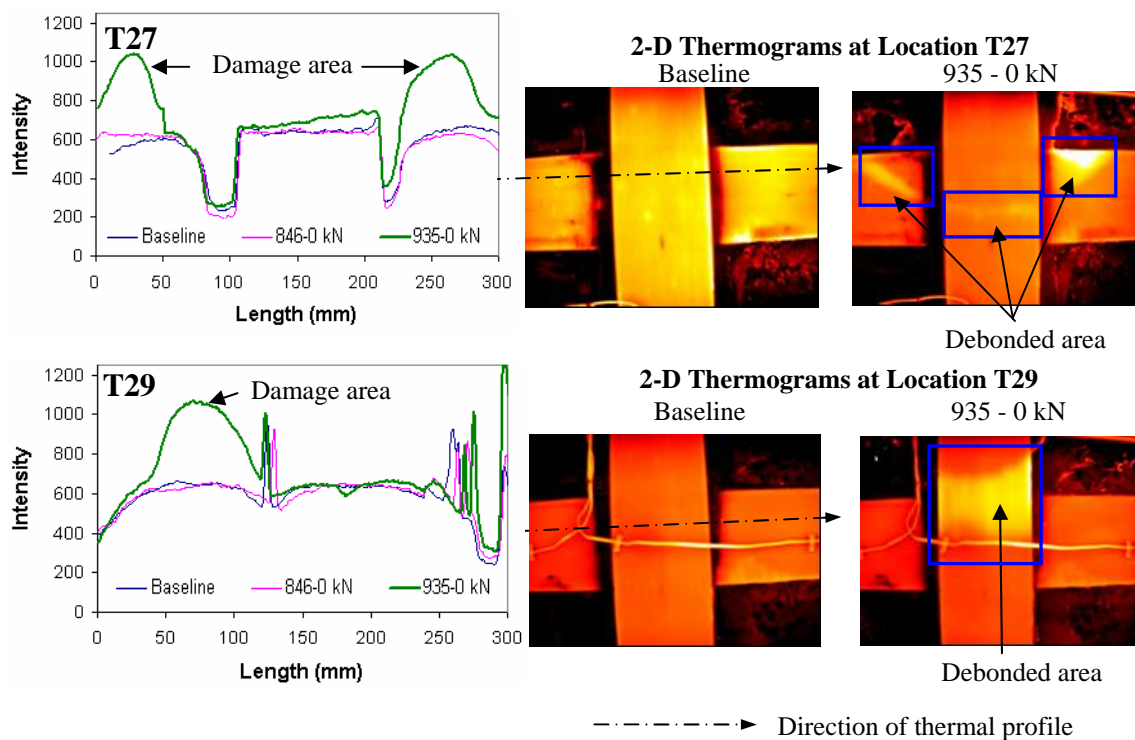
Debonded area at concrete-transverse strip interface (Damage after failure)
